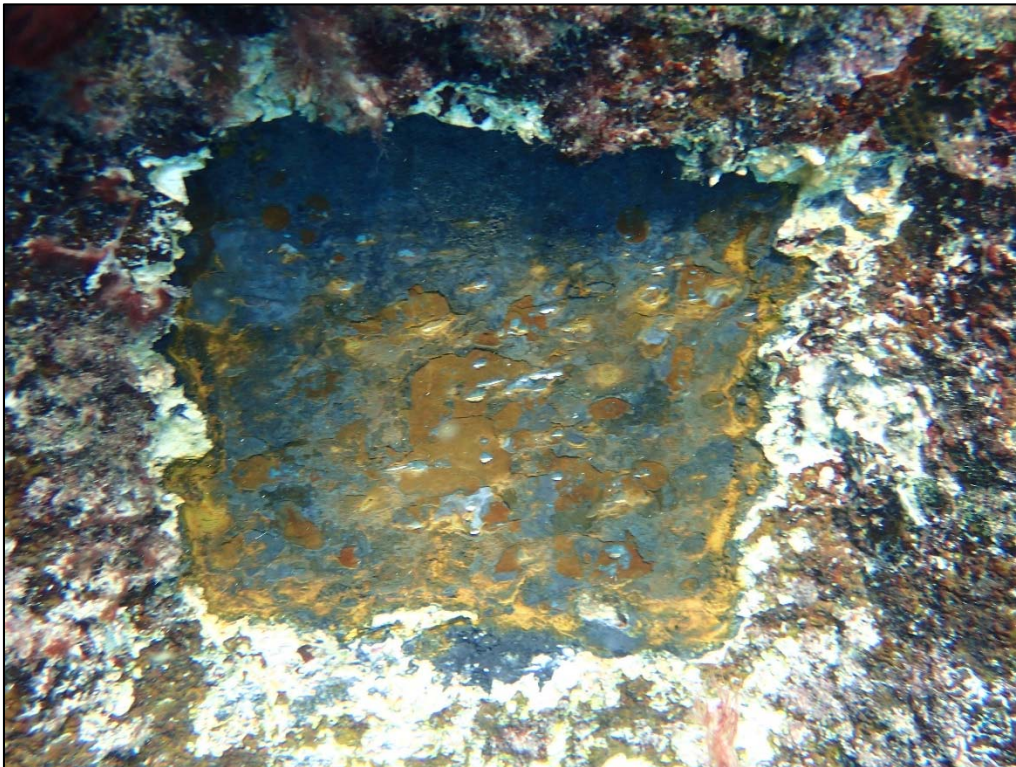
A 12-in. by 12-in. cleaned section of sheet pile web at Station 0+14, south face of Berth 1. The face of the web is approximately 12-in. wide.
